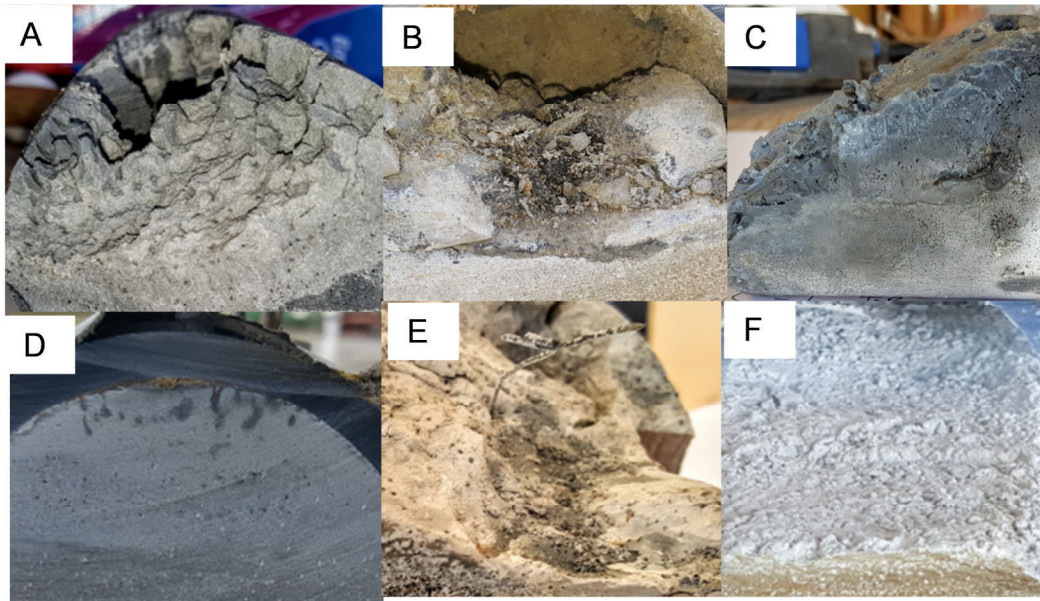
Photos of deficient grout from elevated sections of MIT test samples.
